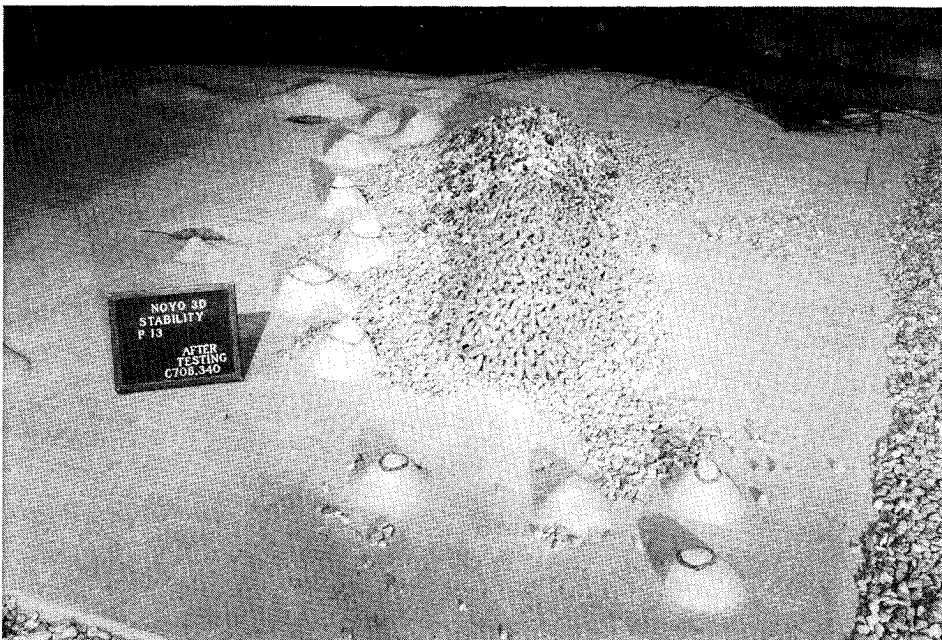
Plan 13, south roundhead after two series of Storm IA waves
